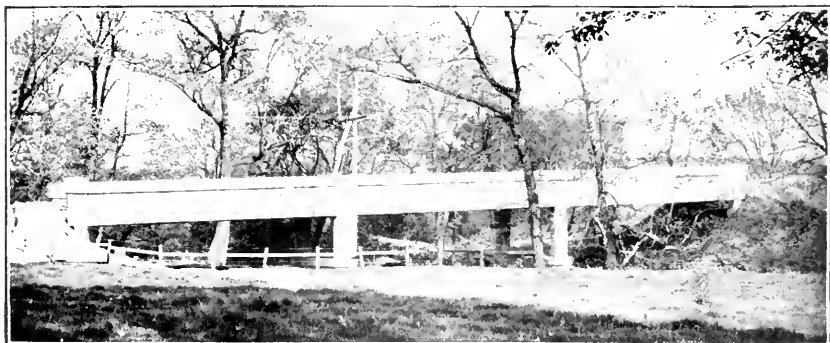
REINFORCED GIRDER BRIDGE, BUILT NEAR SPRINGFIELD, ILL., UNDER SUPERVISION OF ILLINOIS HIGHWAY COMMISSION.
